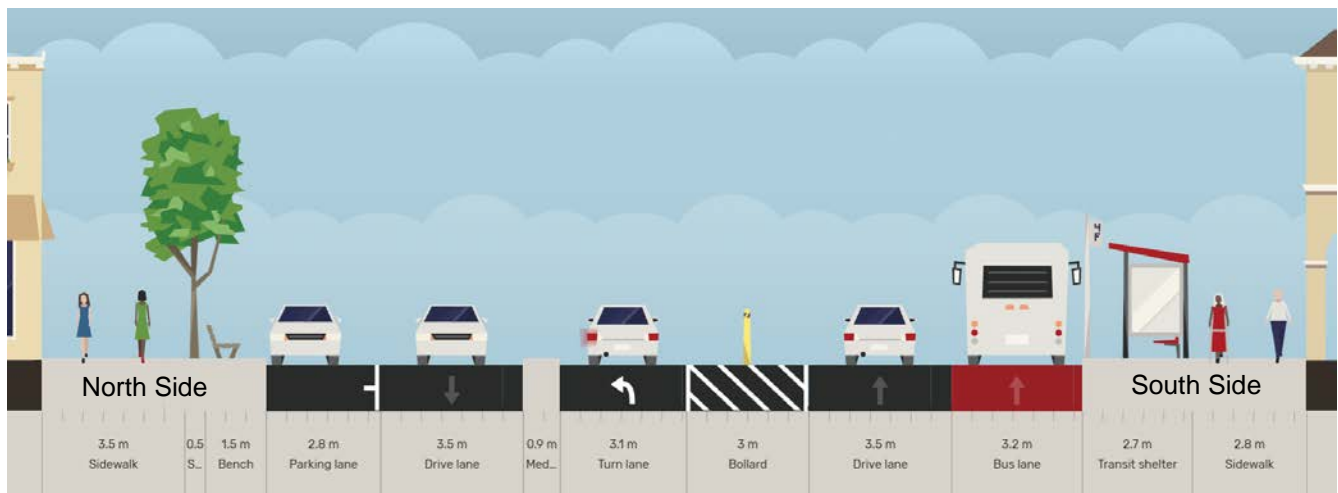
Option 2 Cross-section at First Street, Looking East
